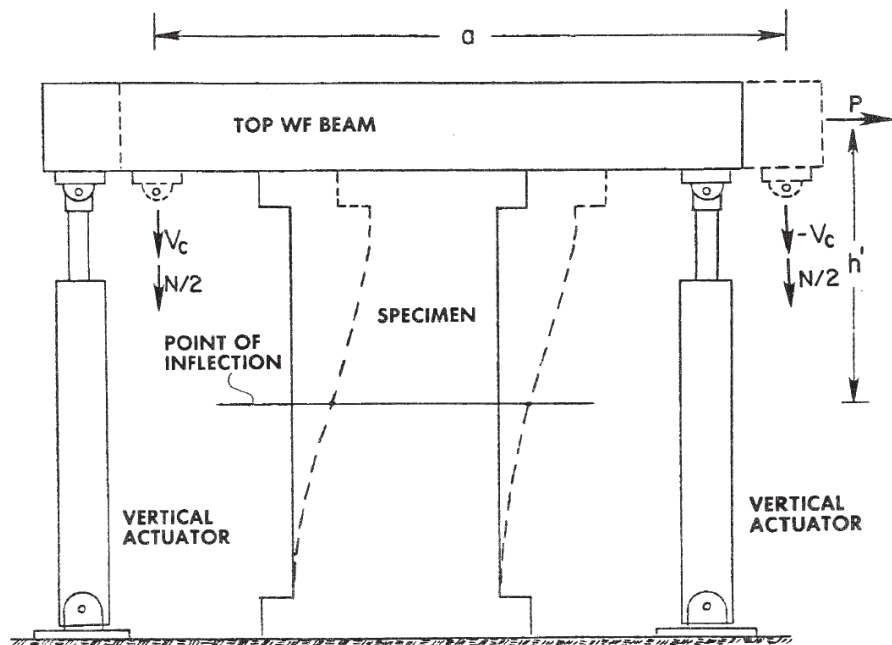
Mode of shape of tested walls (Sveinsson et al., 1985)
